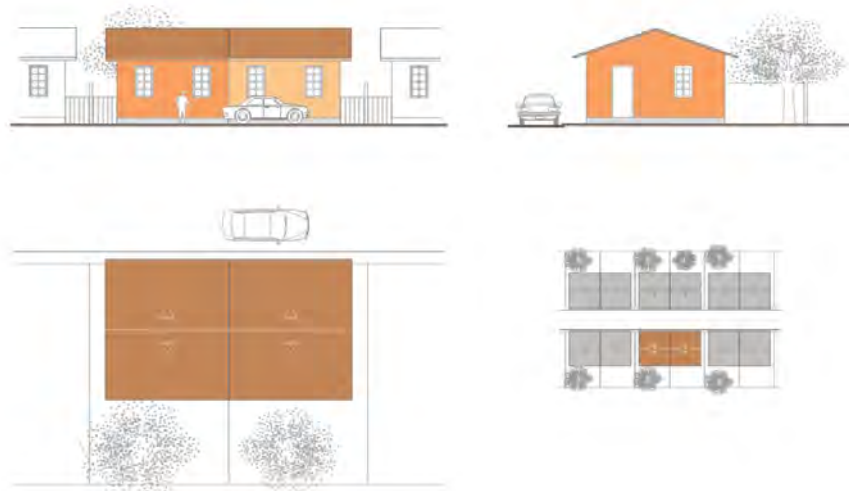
Wooden townhouses. Schema of façades, building implantation and situation. Characteristics: townhouses (two windows/ two windows in the frontal façade), with their frontal façade on the alignment of the street; their entrances and main doors are on the lateral façade; narrow lateral spacing conducts to the backyard; narrow pavements separate the houses from the streets; roof of ceramic tiles, with two inclinations and small edges; and wooden walls – a technique called “tabique” (Vasconcellos, 1979) (Source: schemas produced by the authors, no scale).
